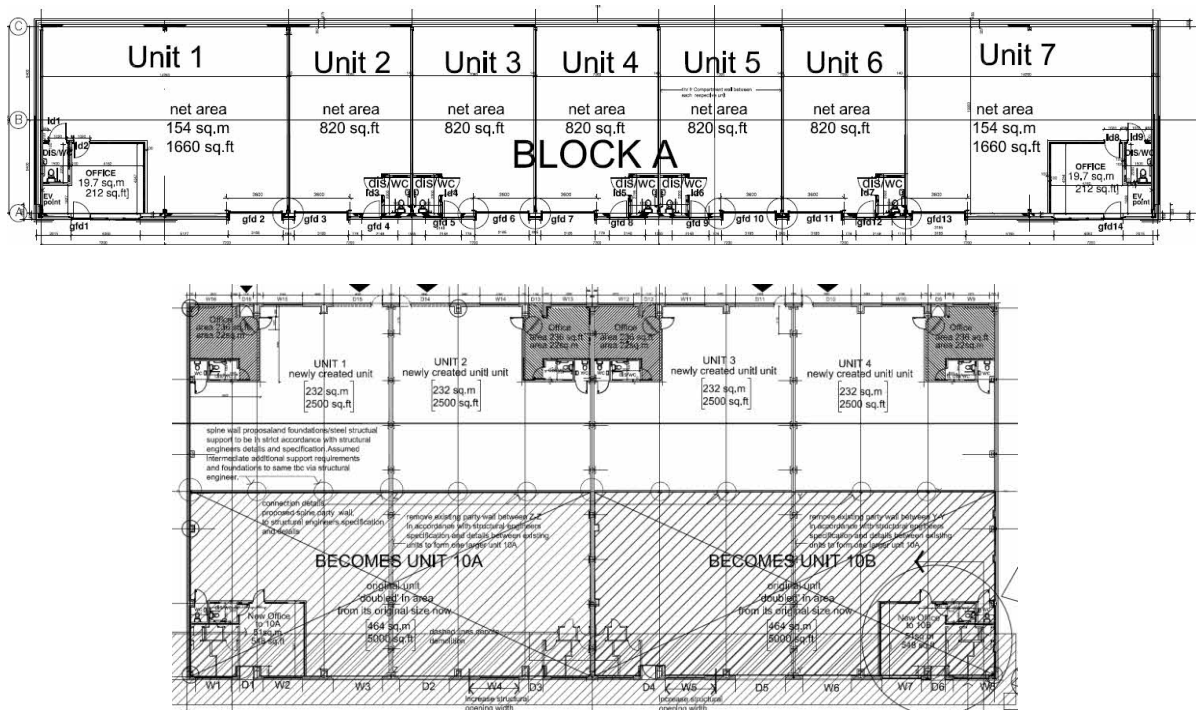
Proposed floor plans for the proposed 2No. blocks at Site B
